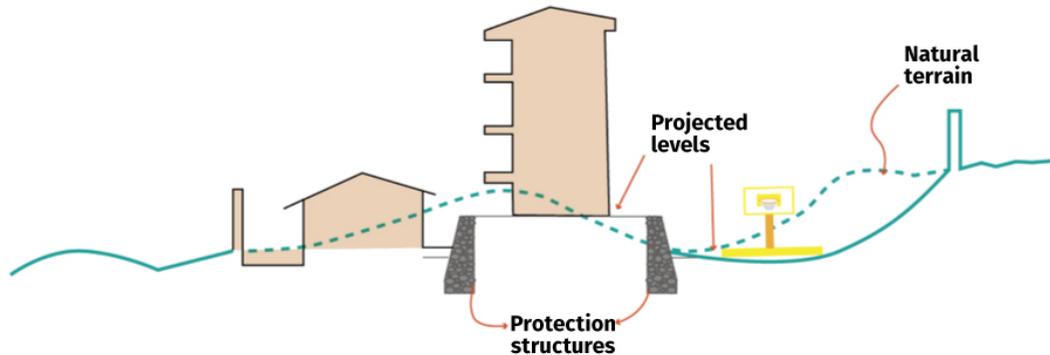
Terrain profile and creation of terraces on the site (UNDRR/CAF)
